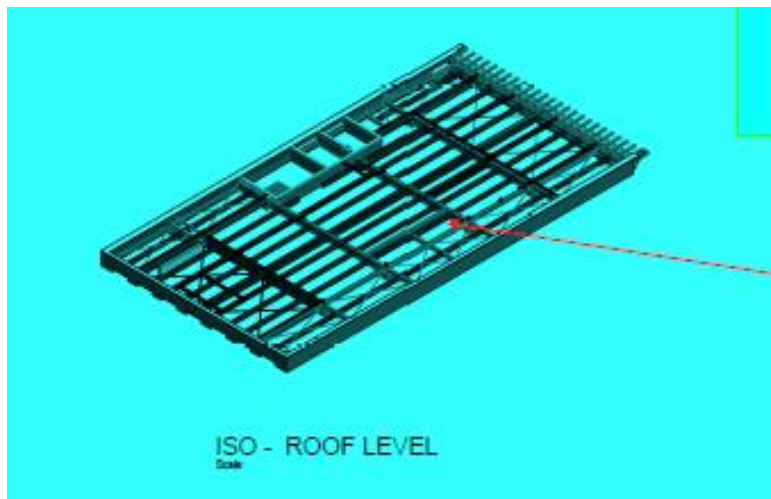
Proposed roof level outline plan, steel frame grillage. (Source: TTW, drawing number ST-285- 60-00-50, November 2018)
